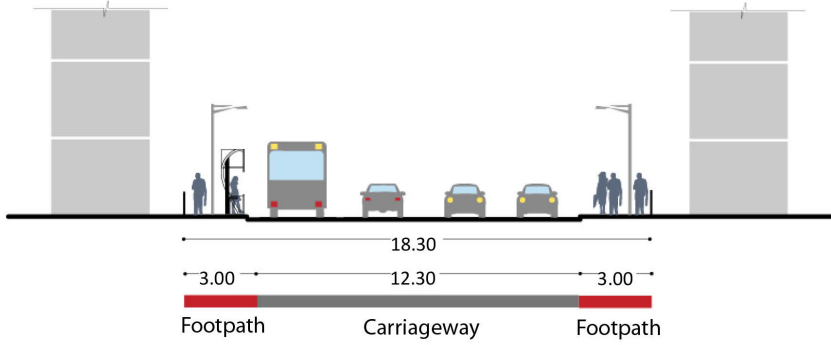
Allocation of Right of way for 18.30M Road (Alternative 2)
